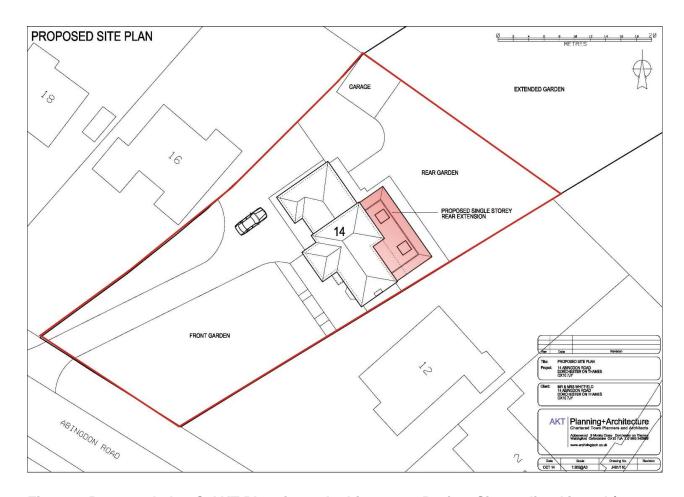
Proposed plan © AKT Planning + Architecture - Project Site outlined in red / Extension shaded in red.
